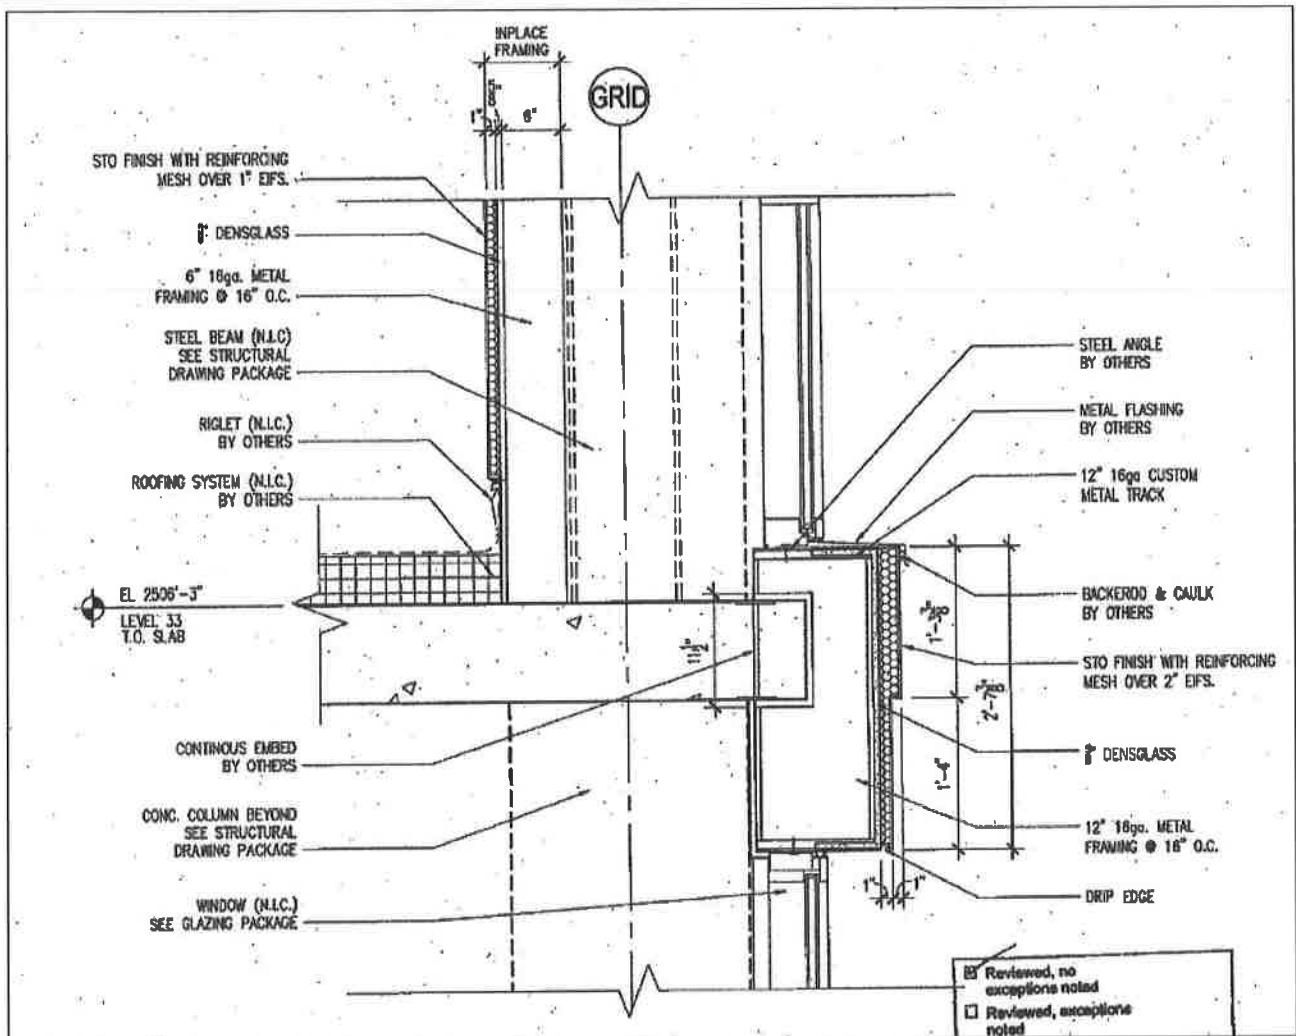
Construction Drawings: EIFS Shop Drawing Detail 1 Showing no Sill Pan Flashing
